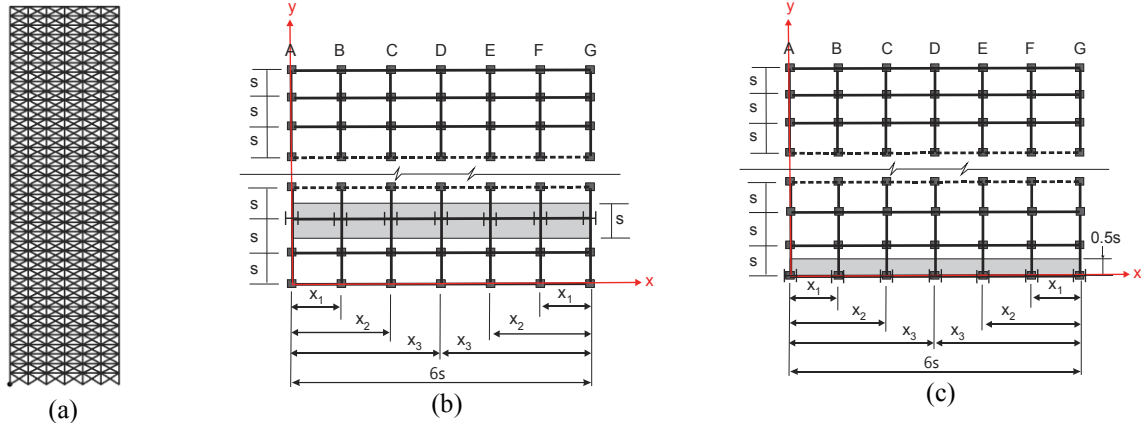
(a) Initial 40-floor planar frame layout (b) Typical floor plan (x-y plane; z: gravity direction) showing interior frame (c) End frame
